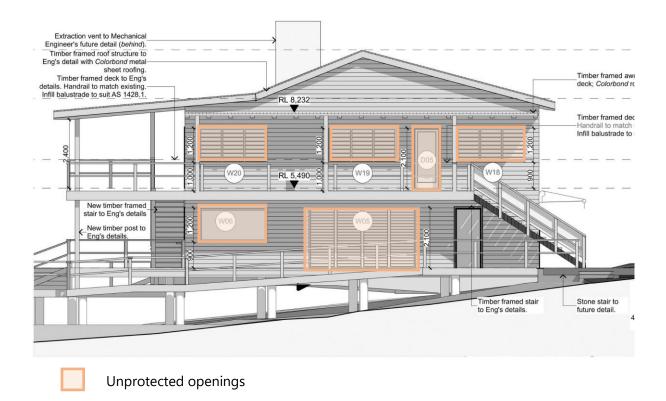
Openings on Main Building Southern Wall within 3m of Crown Boundary / Site Boundary
